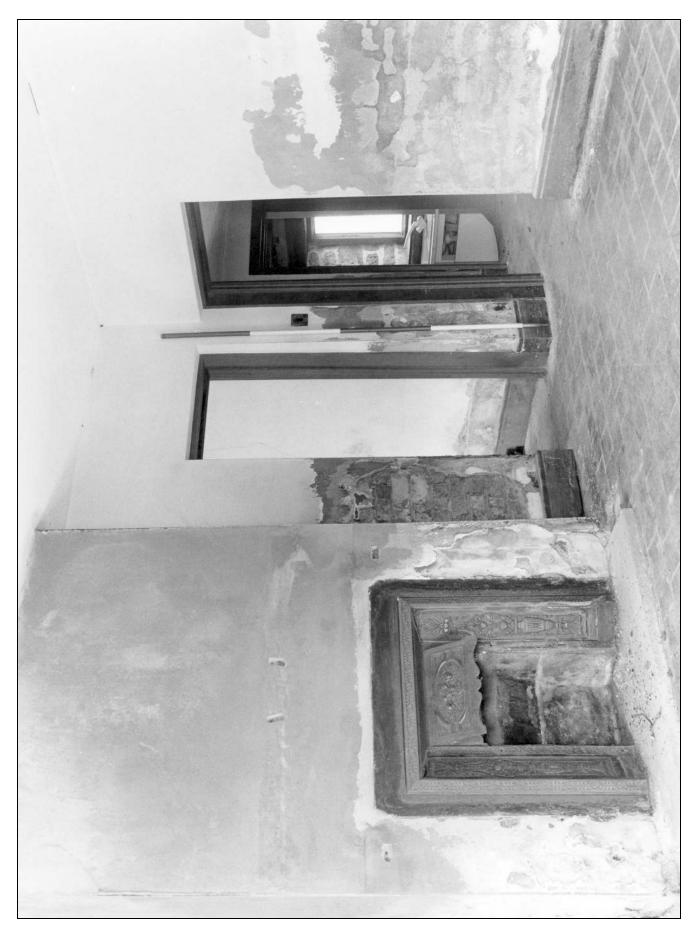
Living room 2, from the north-east (film 1, frame 5)
